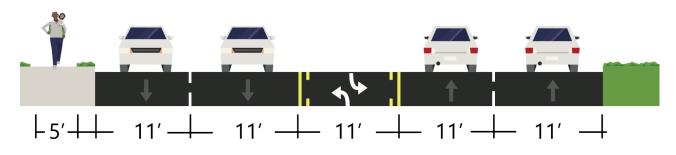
Typical Cross Section, Segment 3: 9th Street to 18th Street (looking north)
